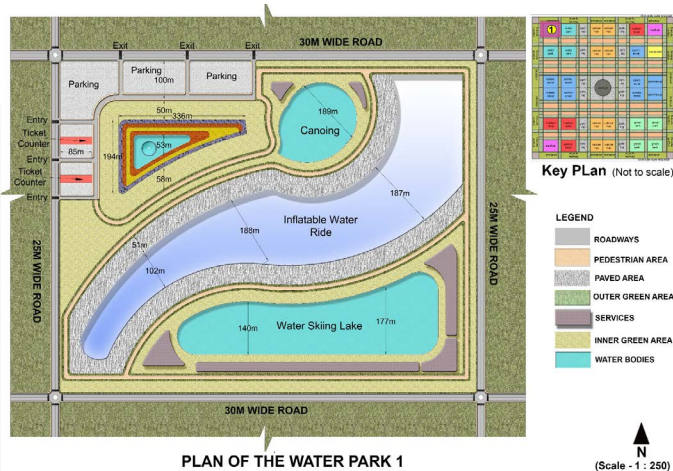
The proposed plan of the Water park 1 for the proposed Ideal Township.
